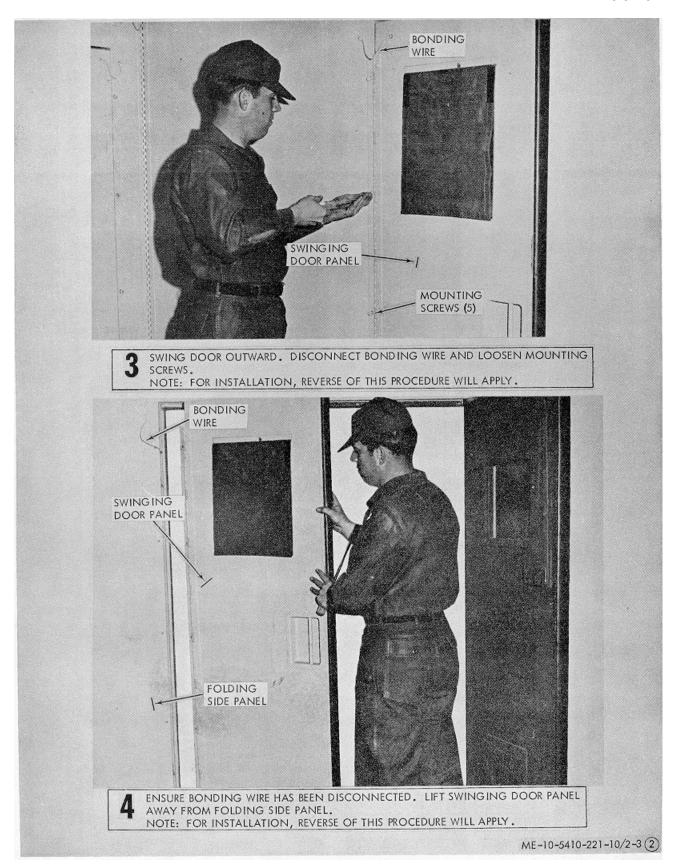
(2). Interchanging removable panels and swinging door panels (Sheet 2 of 4).
